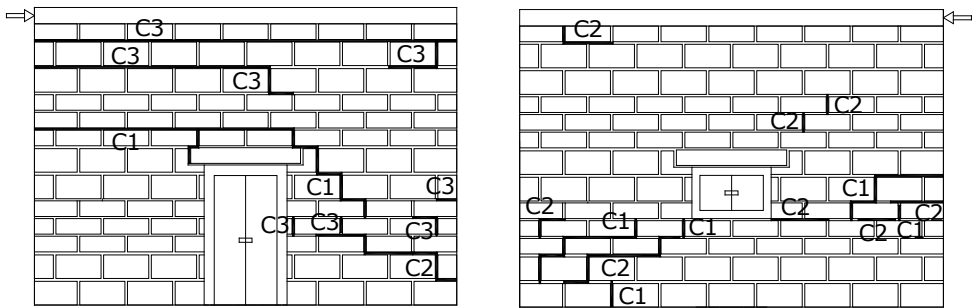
Model of masonry type B (HM-2) after testing under static load
